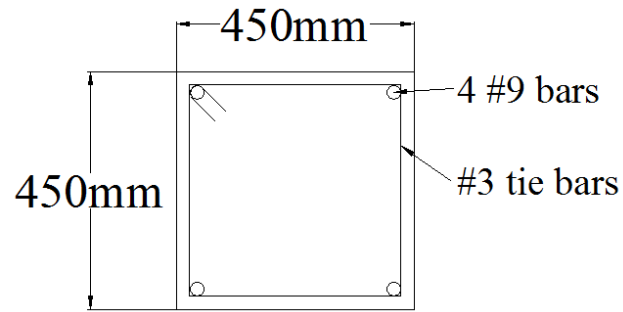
Column Cross-sections of CC and CEX for top 4 floors and CI for all floors
